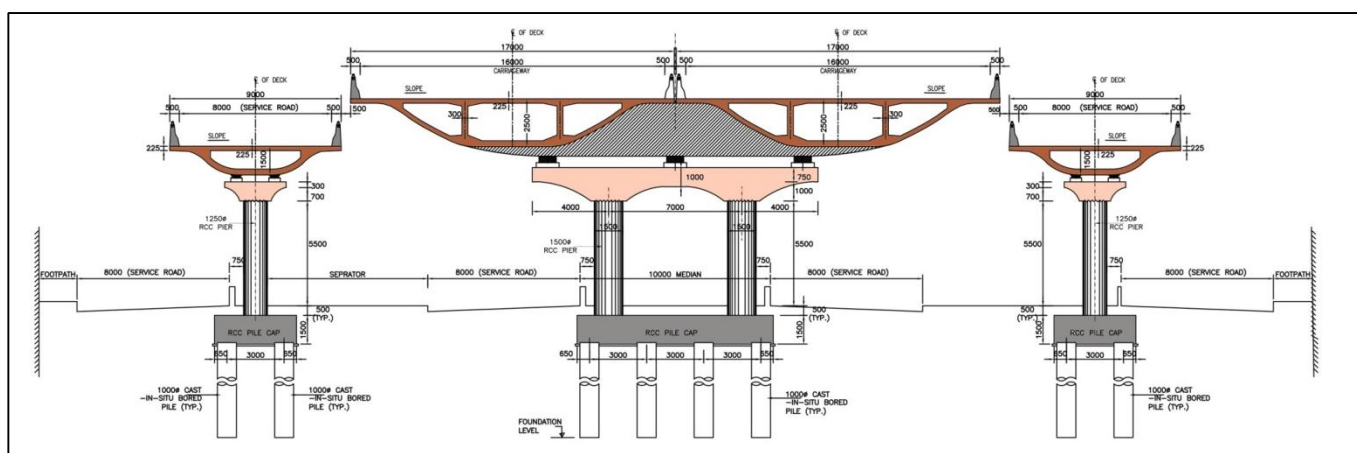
Typical Cross Section (TCS - 1) of Elevated Portion with Elevated Service Road
